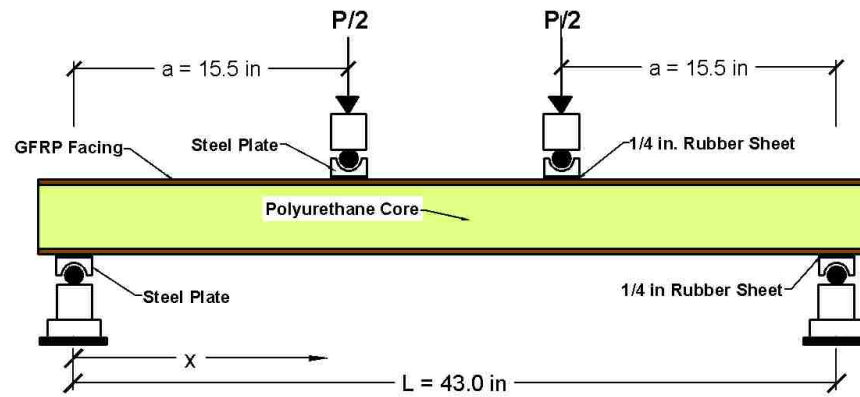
Schematic of four point bending test setup. Web core perpendicular to the plane of drawing is not shown. (all dimensions in inches, 1 in. = 25.4 mm)
